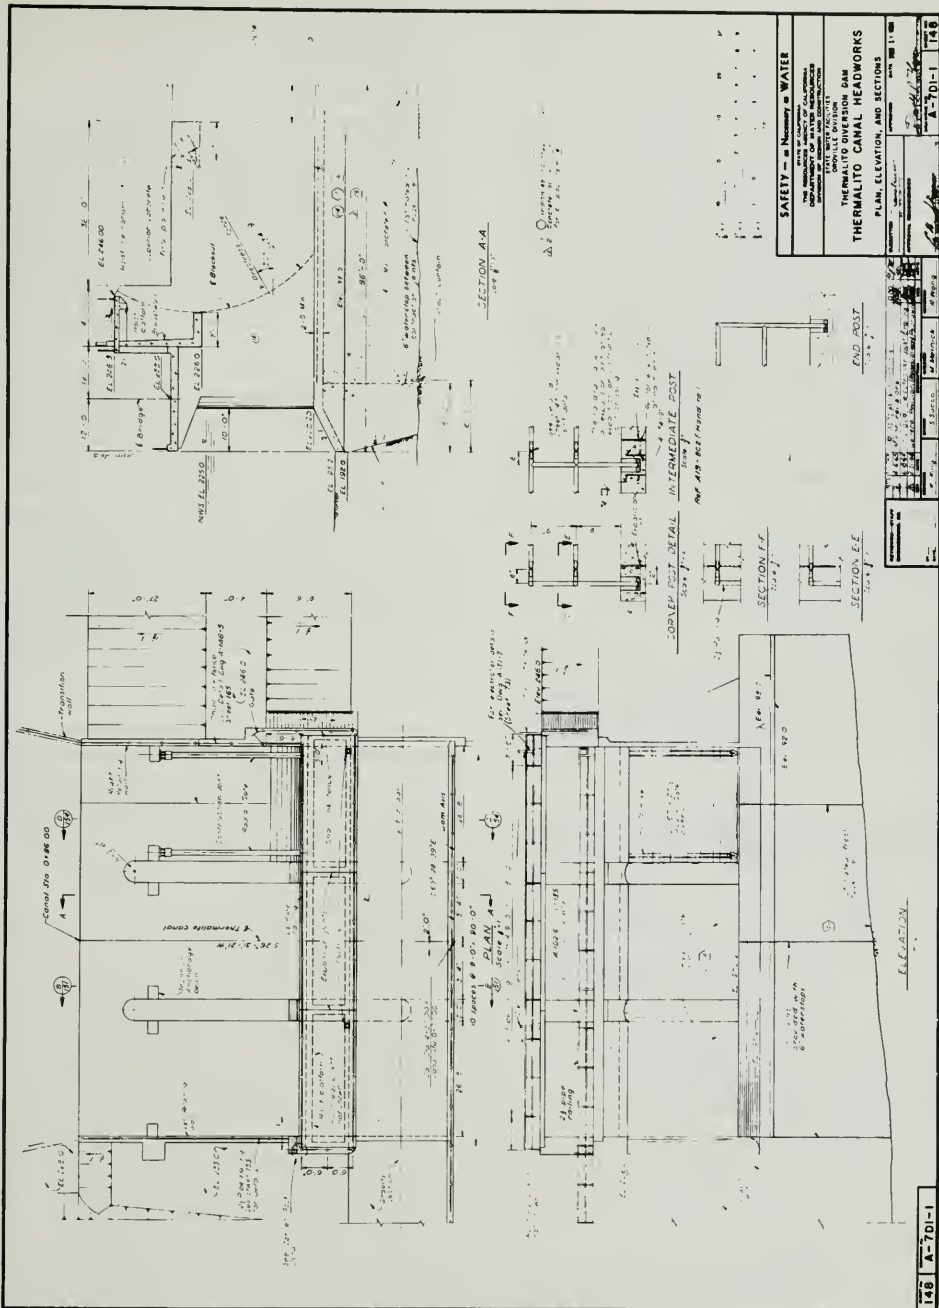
Power Canal Headworks—Plan, Profile, and Sections
